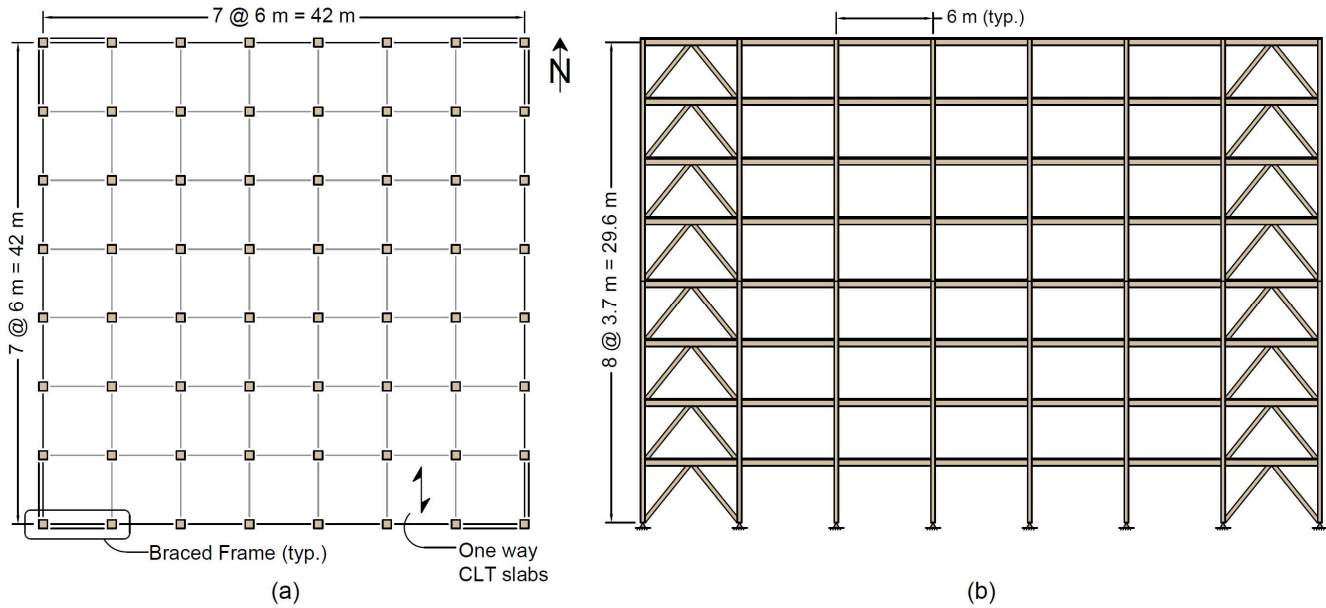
Prototype Building layout: (a) plan view and (b) braced frame elevation (N-S).
